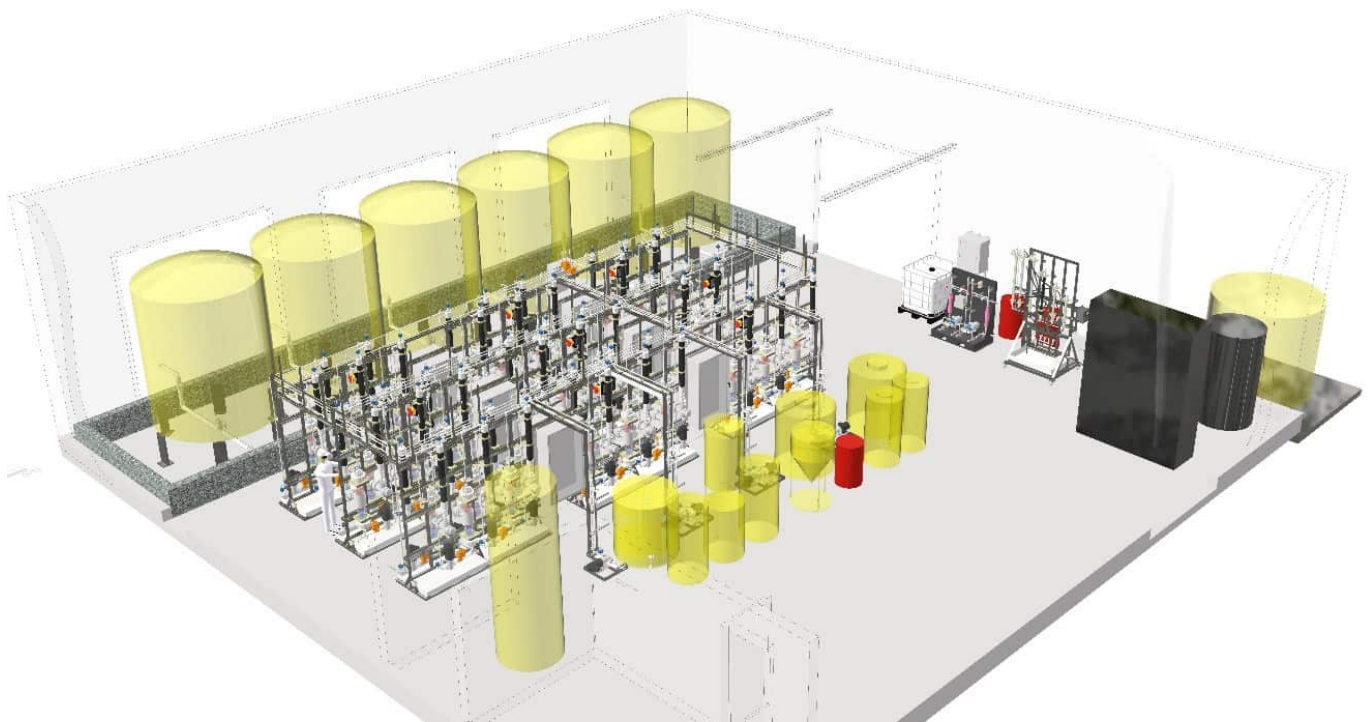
Engineered Design of the Currently Under Construction 51-Stage RapidSX™ REE Demo Plant
